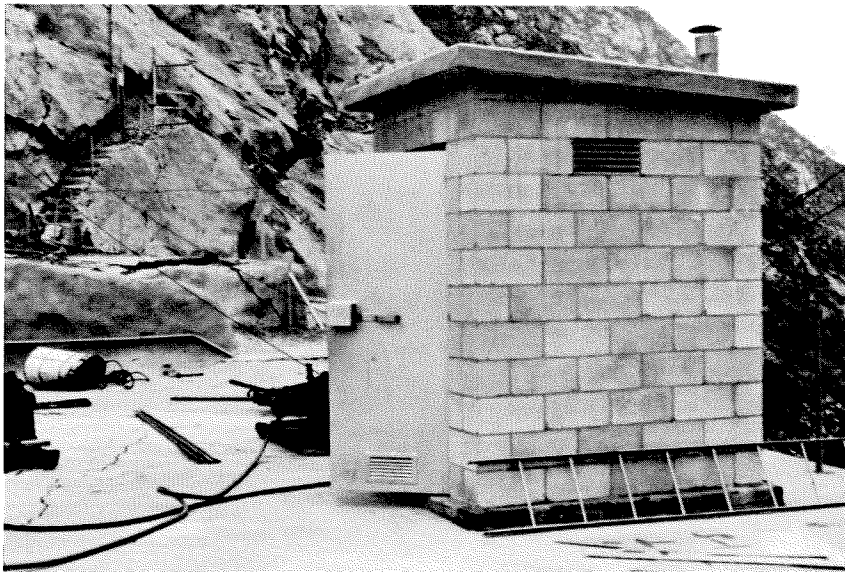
A small concrete block structure on the abutment thrust block at Pacoima Dam was undamaged by the earthquake.
